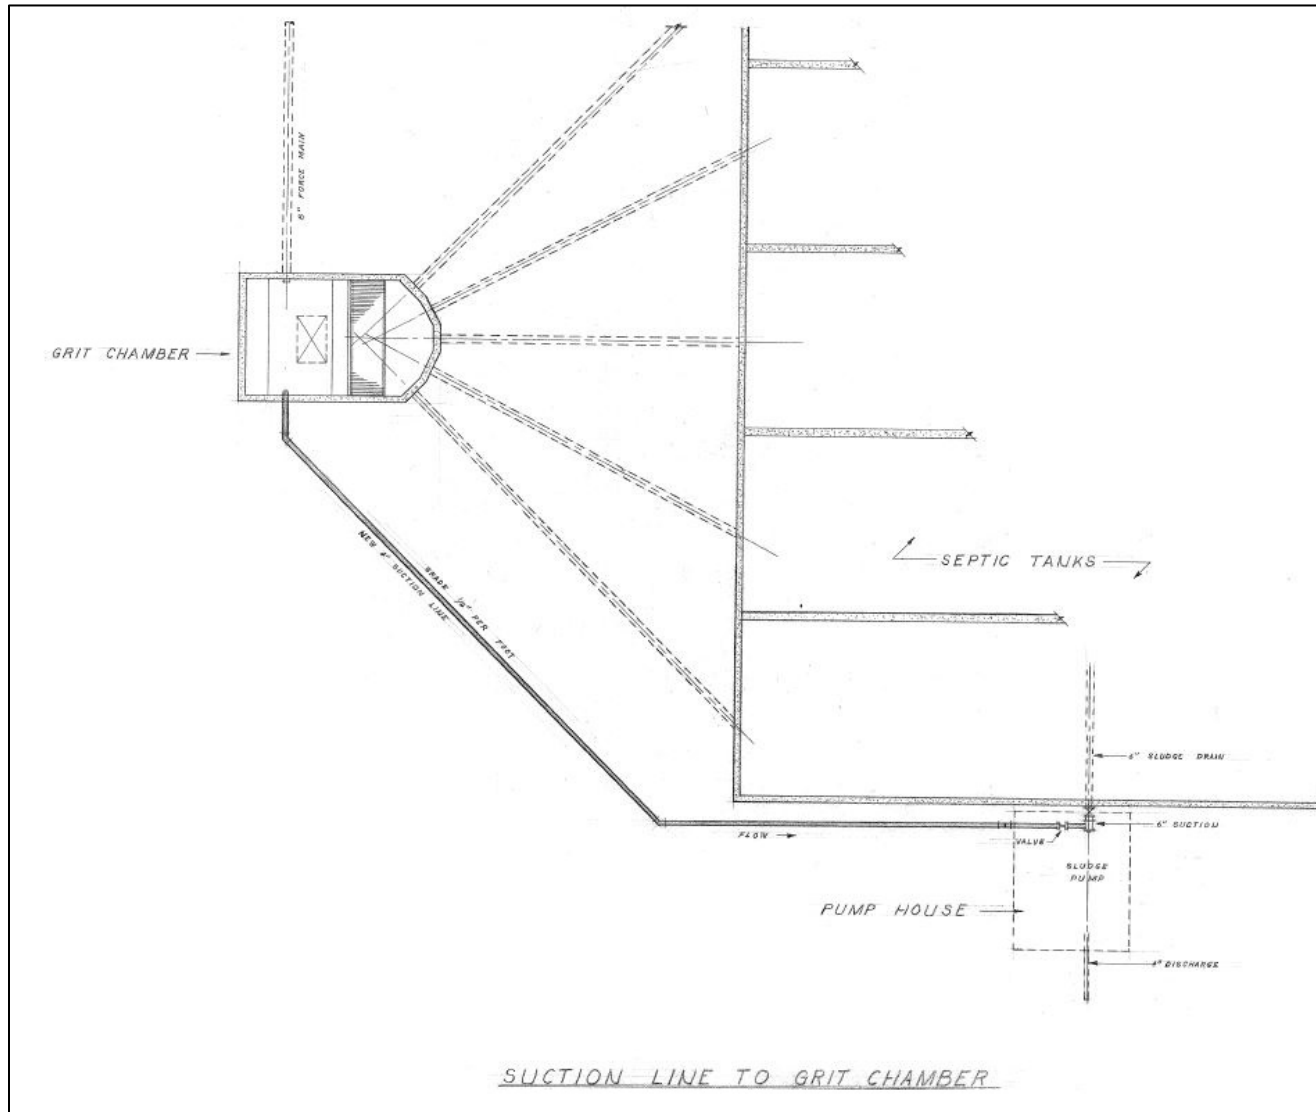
1964 Construction drawing - Sludge suction line details (measurements in feet and inches)
